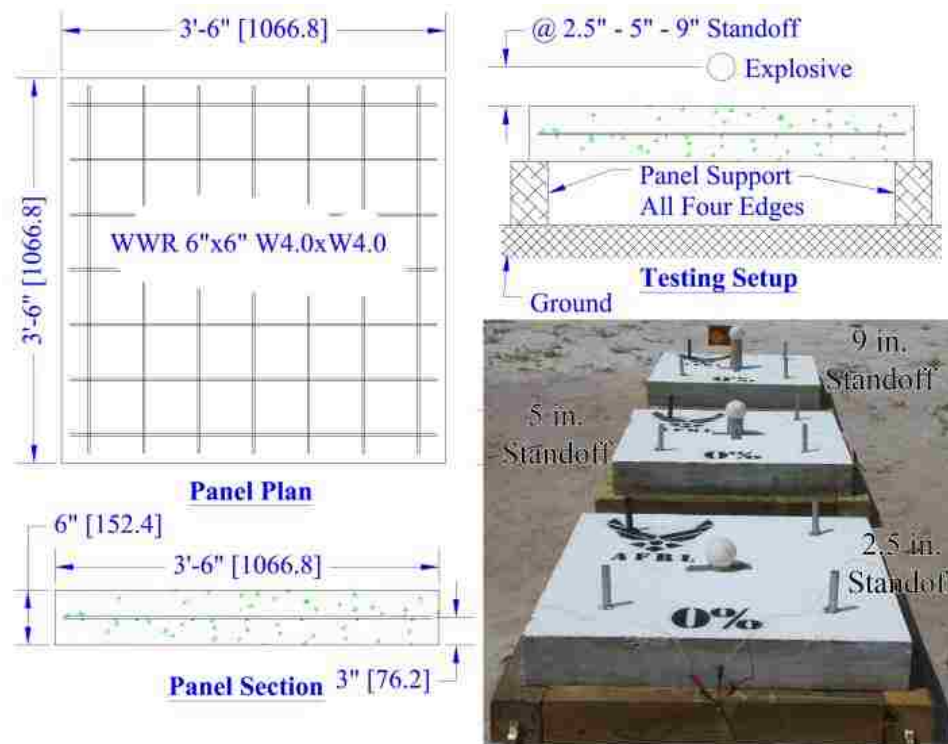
Spall and breach setup (1 in = 2.54 cm)
